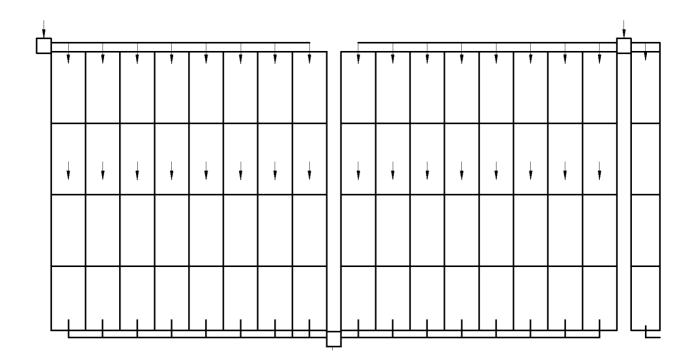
Roof which has been divided into sections of roofing insulation panels
